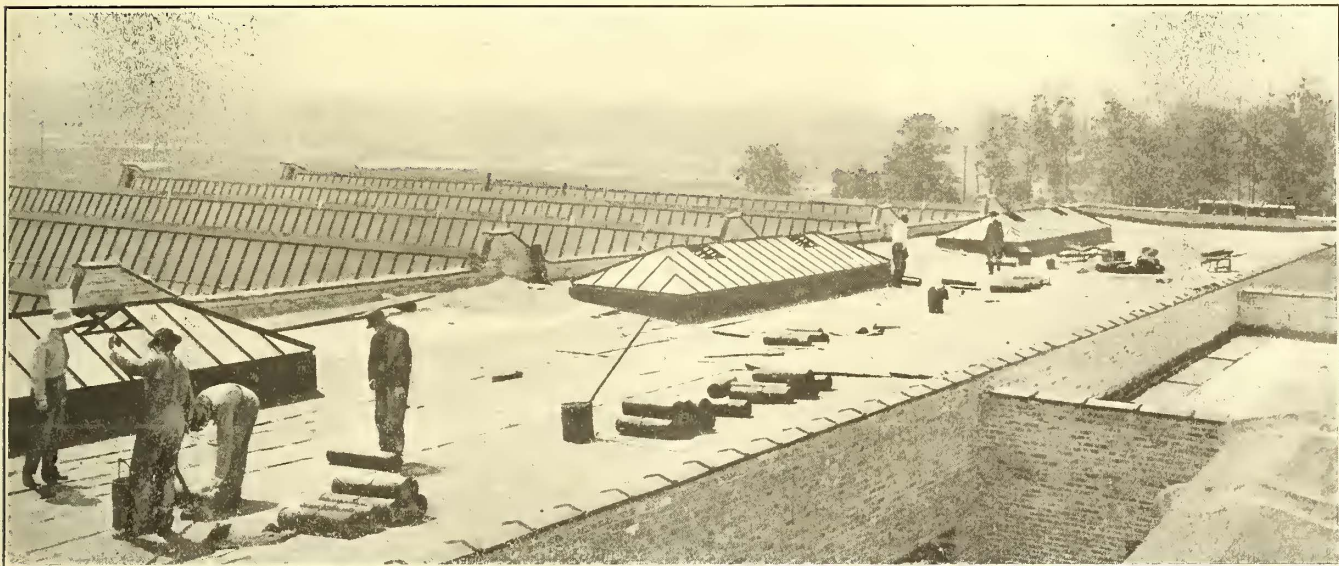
Buildings and Structures—Application of Felt Roofing to Shop Buildings at Milwaukee
